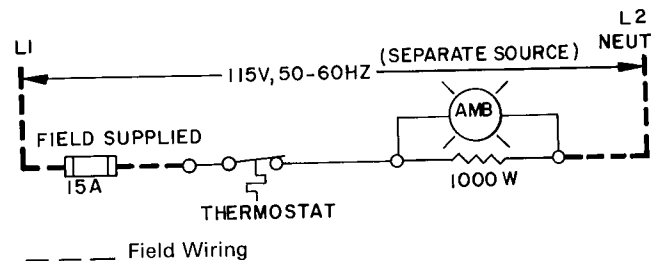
Oil Heater Wiring Schematic (Typical)
